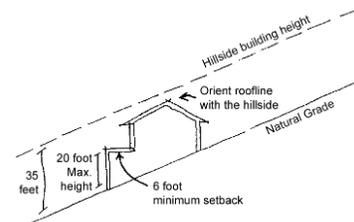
E.2.c. Downhill Building Step-Back
